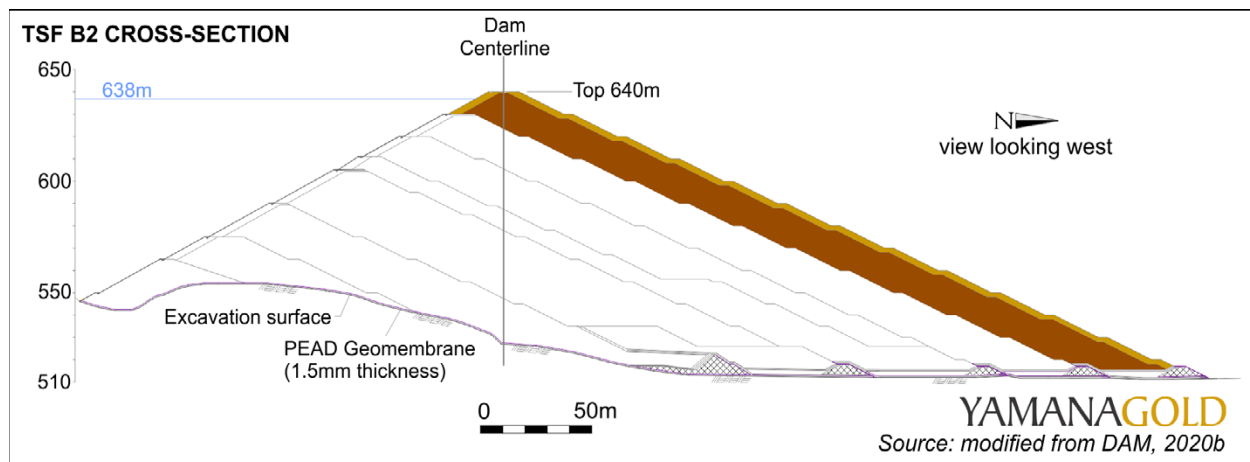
Cross-section of TSF B2 dam at final elevation
